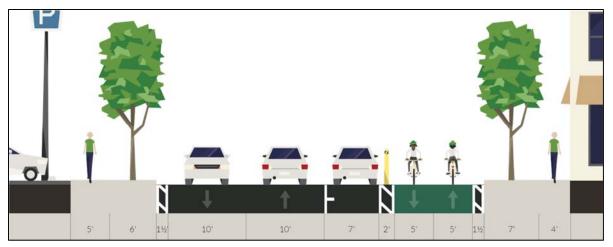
William Street Cross Section between Ashley Street and Main Street – Proposed with Parking
